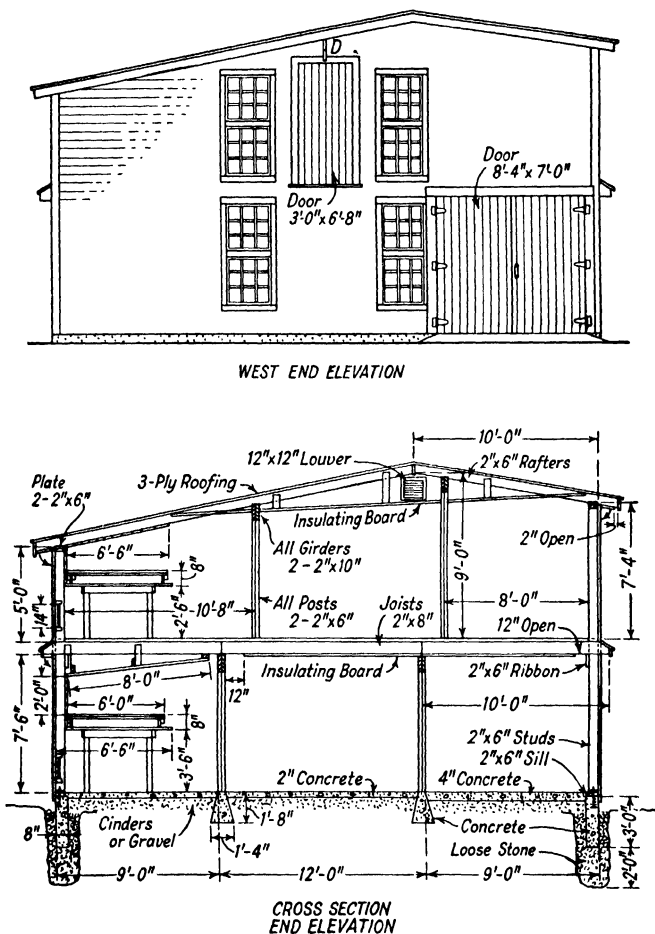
30' x 50' laying house. Provision is made for unobstructed air movement at the ceiling toward the front on both floors.
